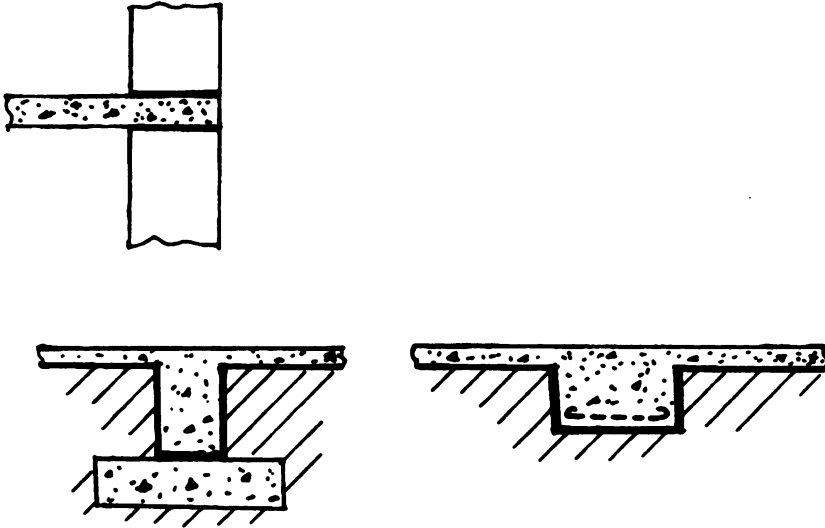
Provision for expansion of roof slabs and beams resting on masonry by kraft paper placed on top of walls plastered with cement plaster with a coat of thick limewash on top of the plaster.
